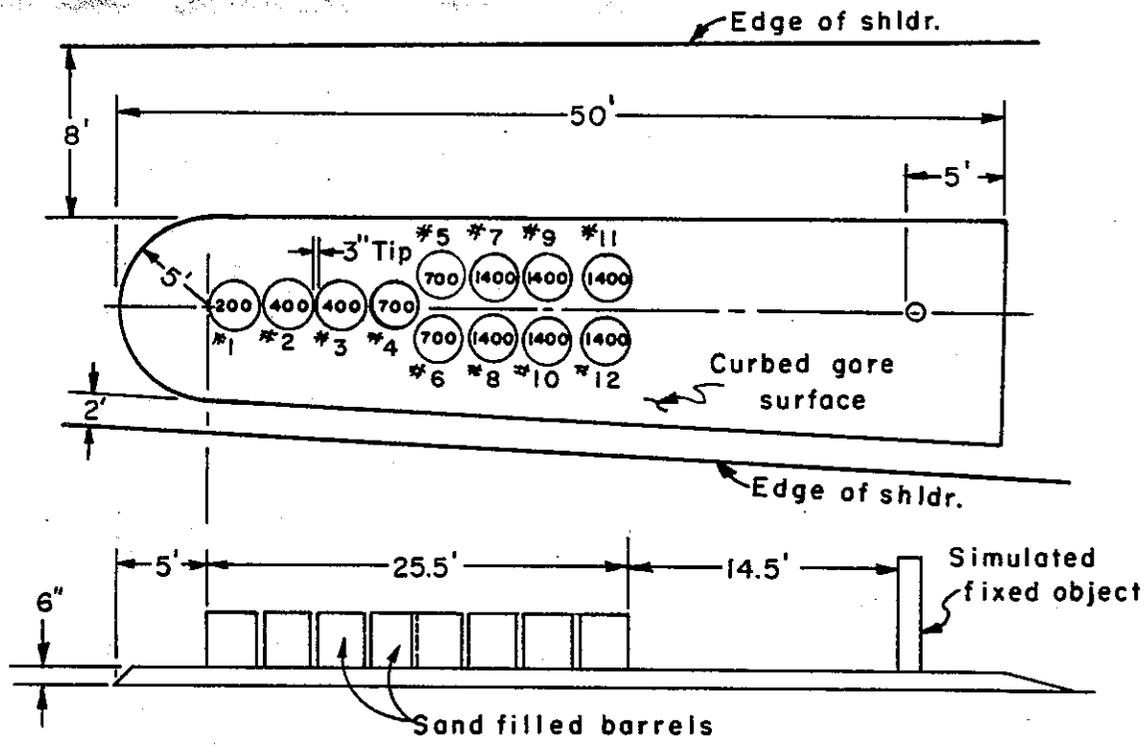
, PLAN AND ELEVATION VIEWS OF SAND BARREL CRASH CUSHION ON 6" HIGH CURBED GORE, TEST 349
